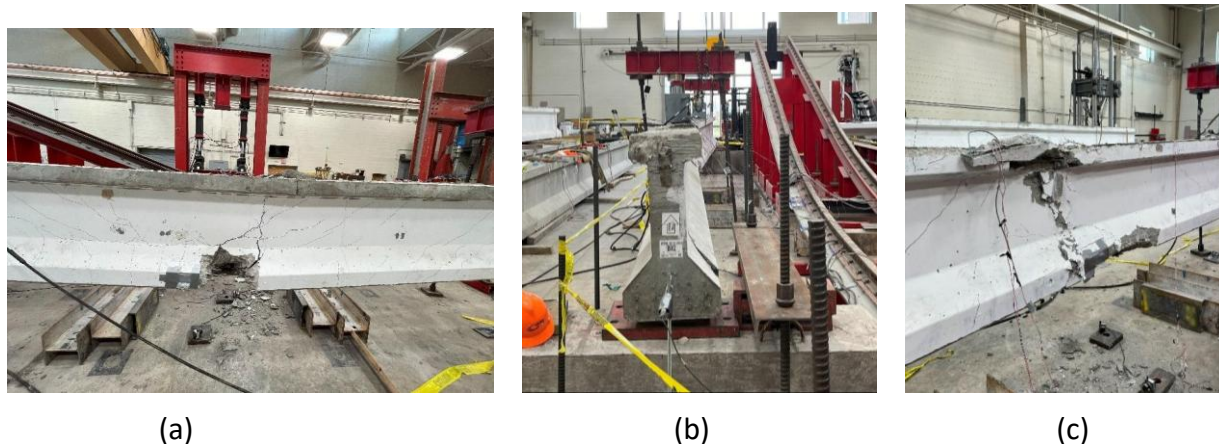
Failure of the Girder G04 (a) Cracks widening at 70 kips, (b) Out of plane deflection, (c) Failure of the girder
